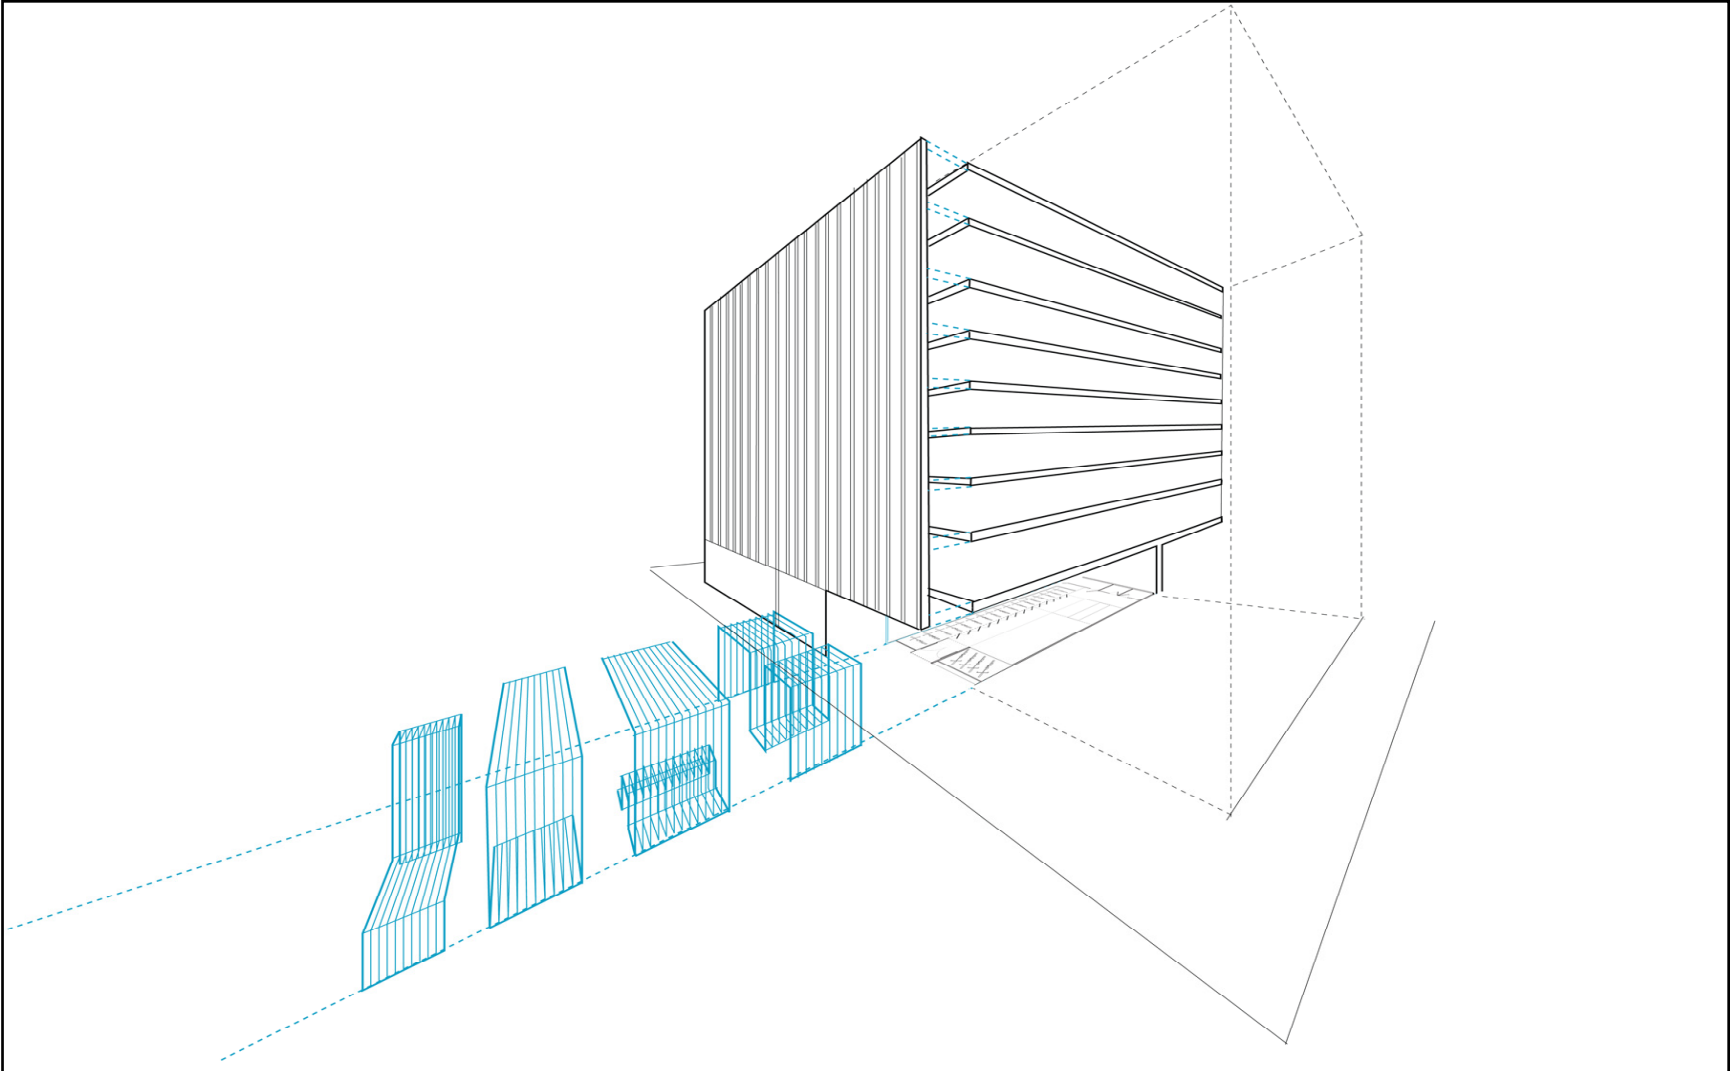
Delivered Prefabricated Surface Inserted into the Building
